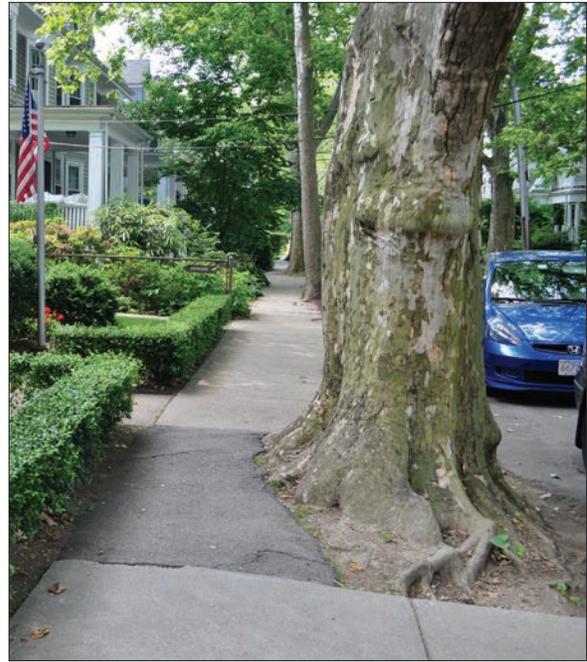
View looking southwest up Beals Street toward Harvard Street showing lifting of the sidewalk caused by the plane-tree roots and trunks, and the resulting unsightly asphalt patches, June 2012).
